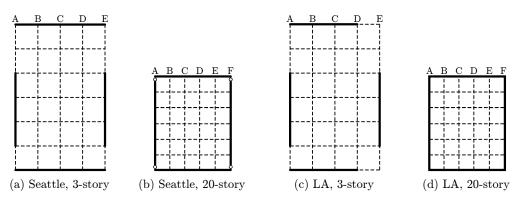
Floor plans showing layout of moment-resisting frames for LA and Seattle model buildings [4].
